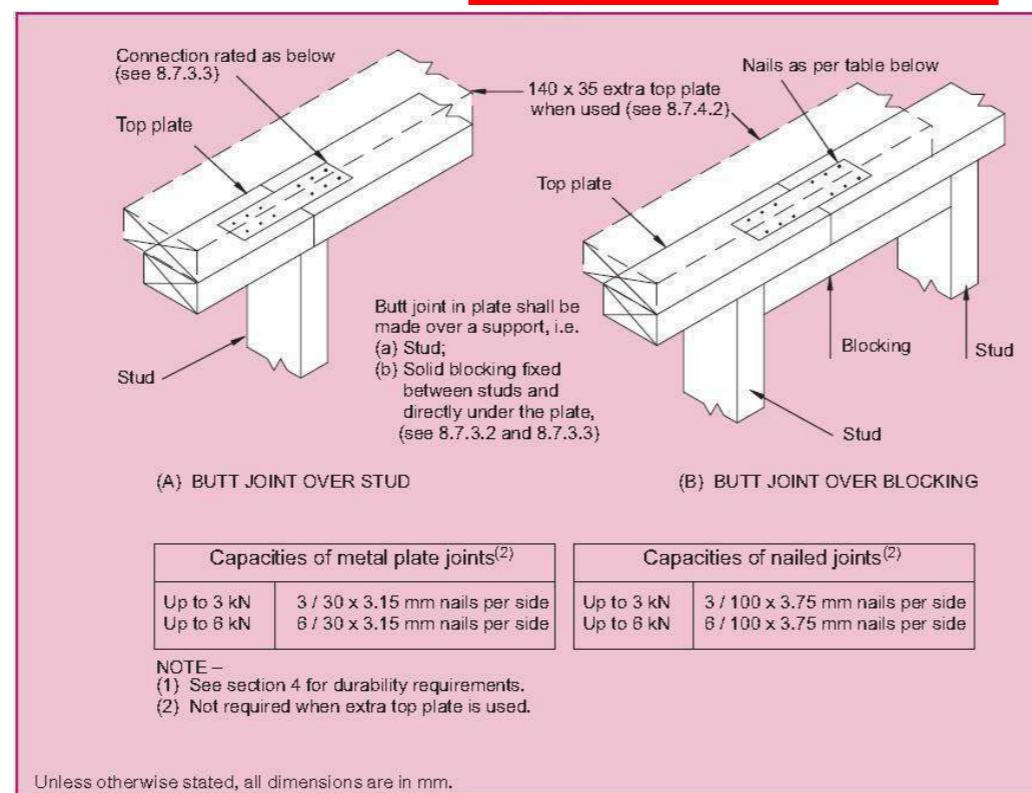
Connecting top plates in line – Walls containing bracing (see 8.7.3.3)
